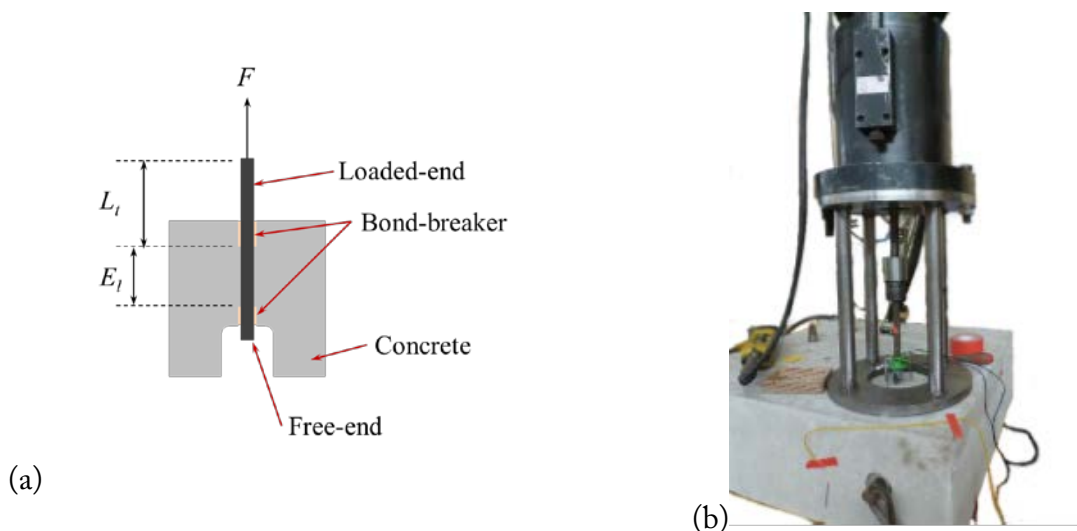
Direct tension pullout bond test: (a) Principle of the test (L_t Length under pure tension, E_l rebar embedded length); (a) and overall photo of the loading setup (b) overall photo of the loading setup
